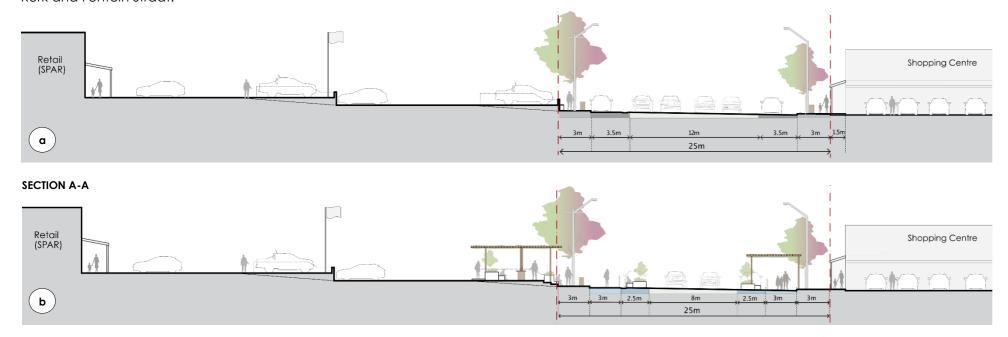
Existing Lang Straat section (a); proposed Lang Straat section, with widened sidewalks, new tree planting and new street furniture (b)
